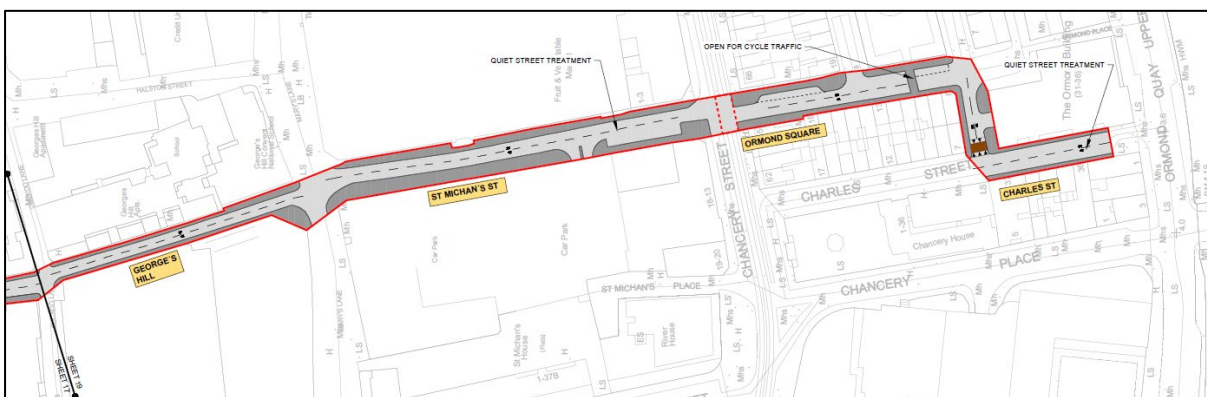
Extract from General Arrangement Drawing Sheet 19
